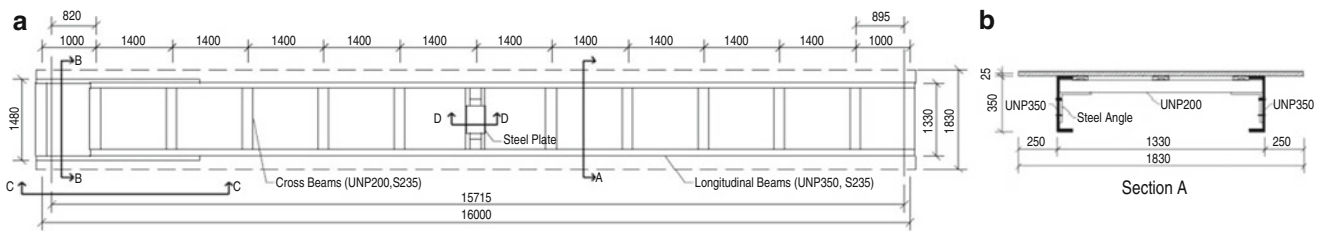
(a) Elevation and (b) cross-section of the laboratory footbridge structure
